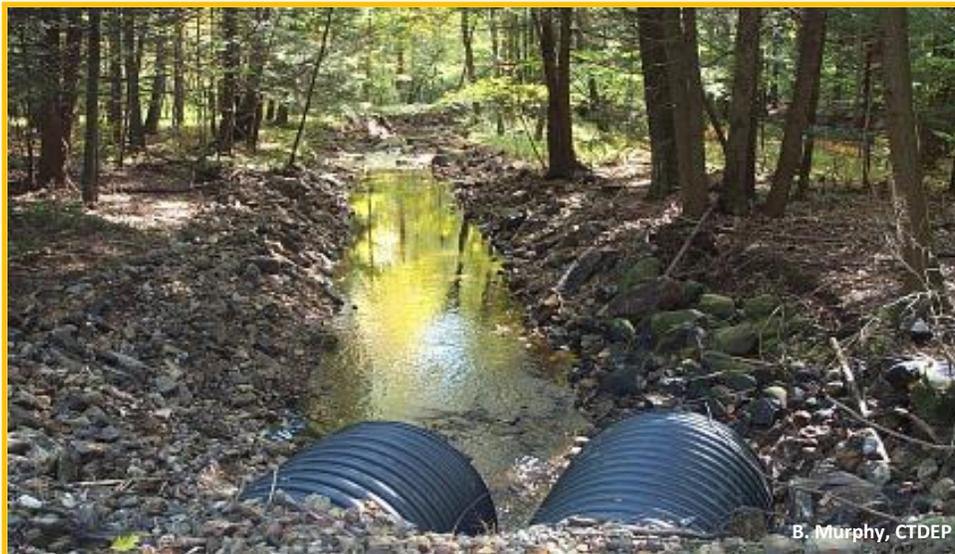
Photograph illustrating skewed alignment of culvert outlet directing high stream flow regimes into streambank and downstream area of past channelization.
